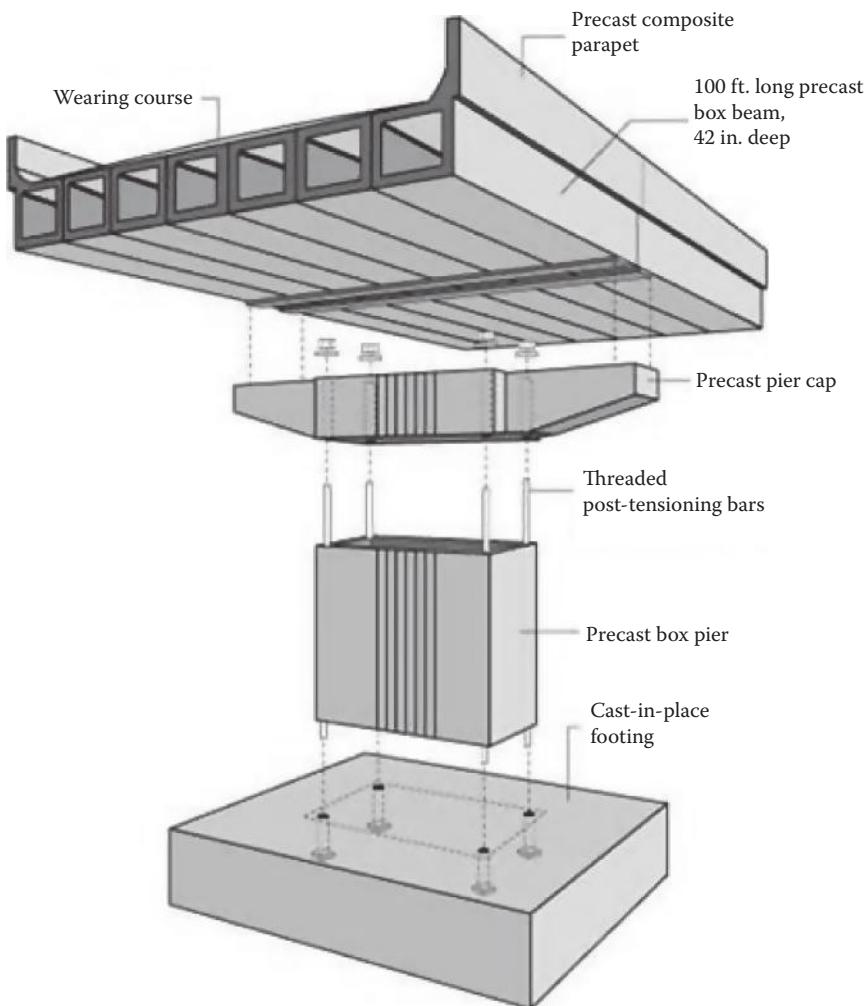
Complete prefabricated bridge elements to form a bridge system used in Puerto Rico's Baldorioty Project.
